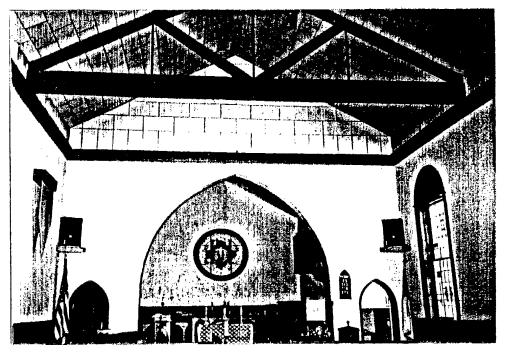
Photograph of the roof where several additional join. Areas such as this require special structural ties to distribute loads around it.
